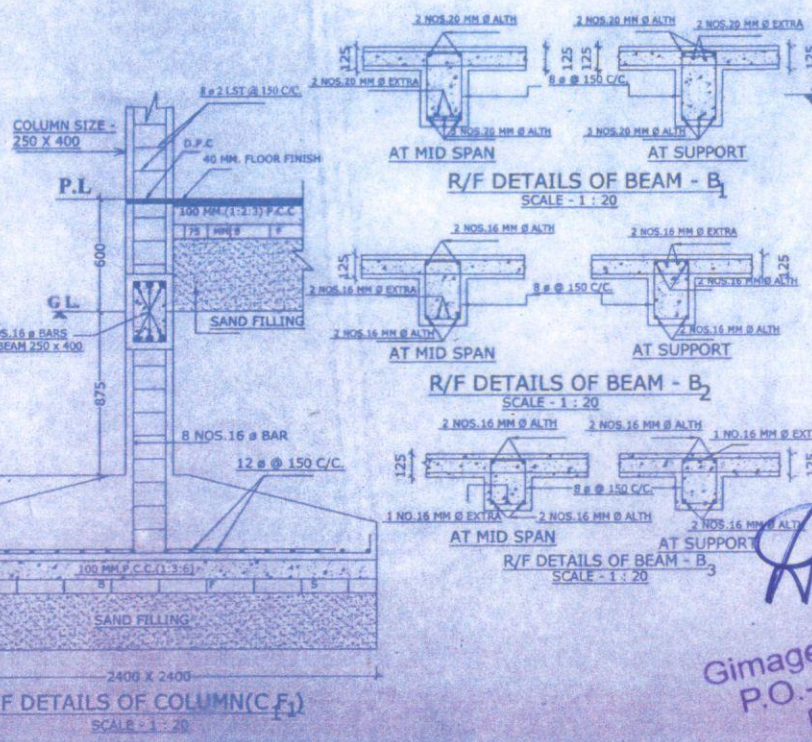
DETAILS OF TIE BEAM LAYOUT & COLUMN FOOTINGS
